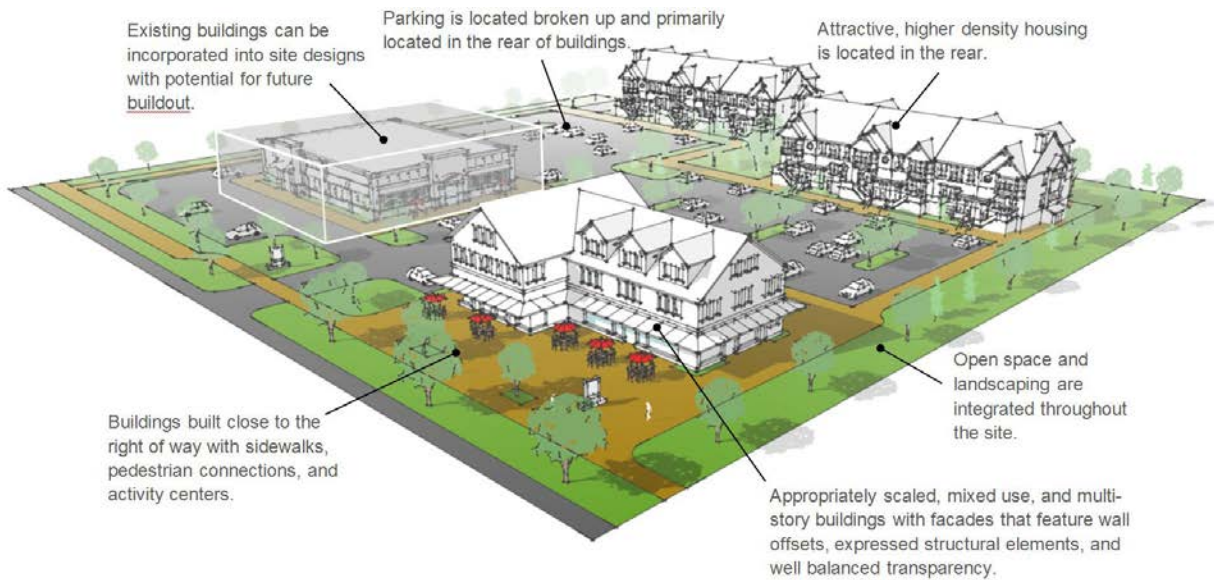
Desired development concepts and approaches around the Columbia Turnpike and Troy Road intersection.
